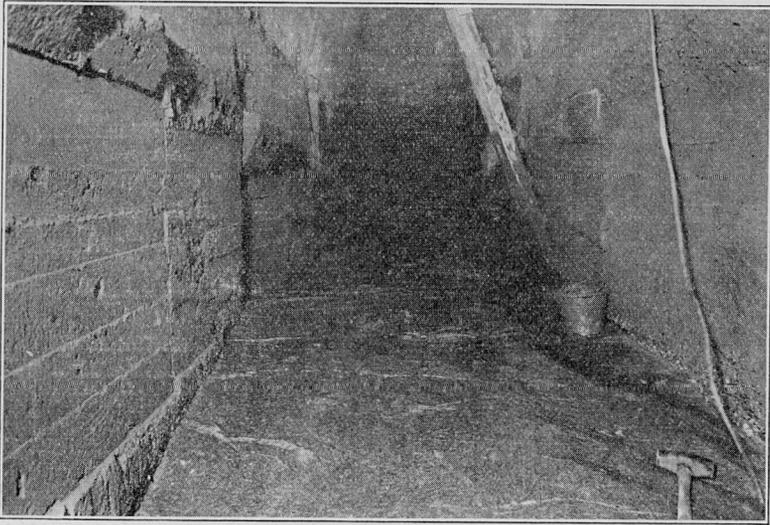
INSIDE VIEW OF CAISSON NO. 5, SHOWING BEDROCK (LOOKING WEST)
